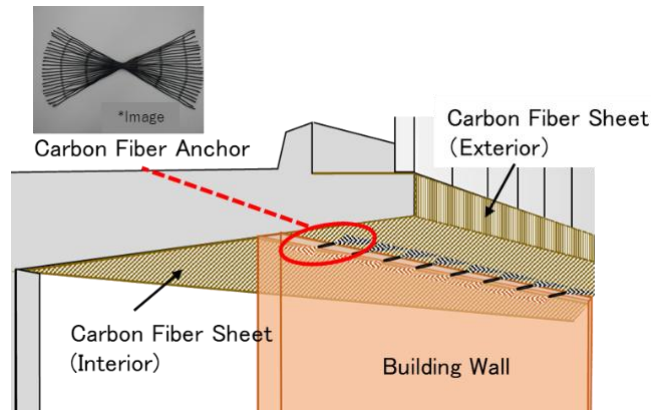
Combination of Interior and Exterior Building Walls Using Carbon Fibre Anchors
